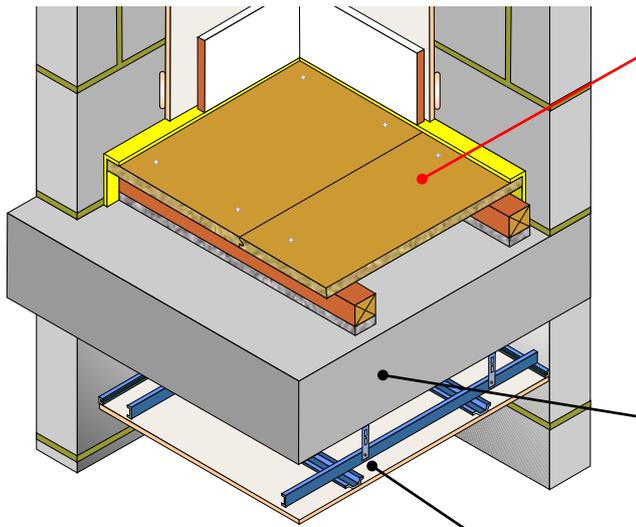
shows DECKfon Batten 45 and ES5/100 flanking strip
